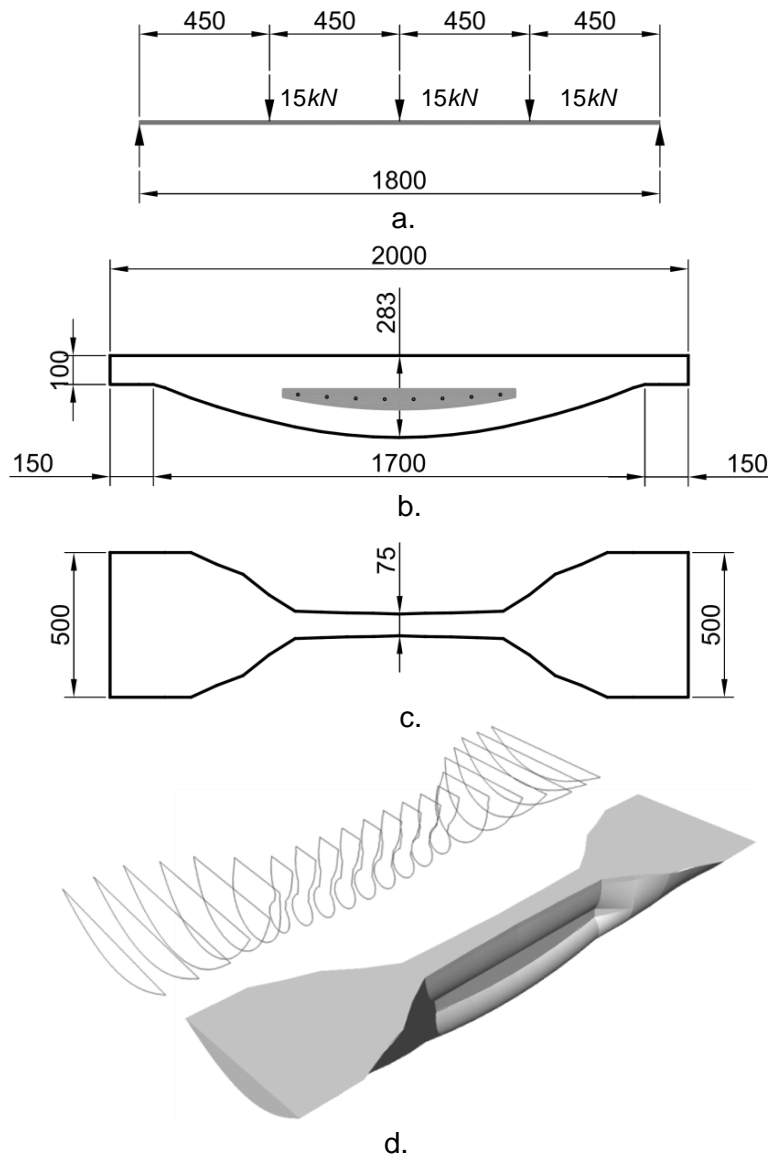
Beam FFB 6 geometry details: (a) loading arrangement, (b) elevation, (c) plan and (d) perspective view (all dimensions are in mm)
